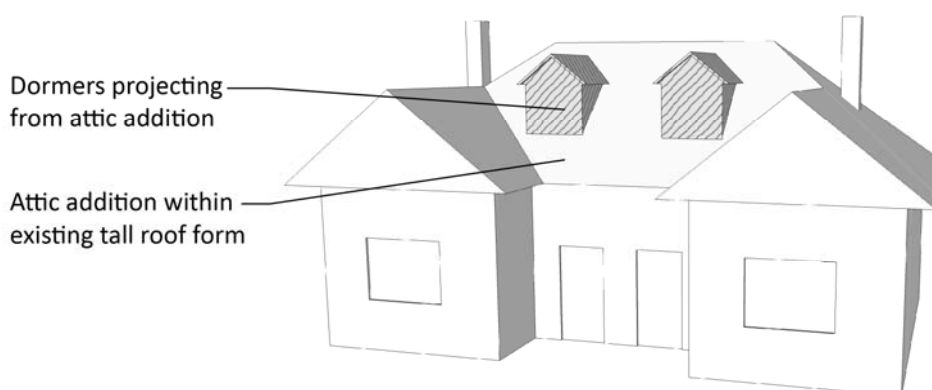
Additions to tall existing roof forms forward of the apex or ridge
